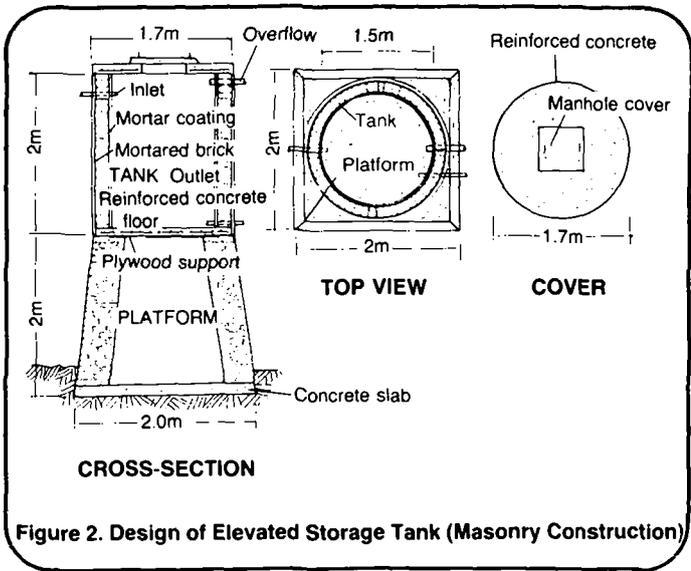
Design of Elevated Storage Tank (Masonry Construction)
